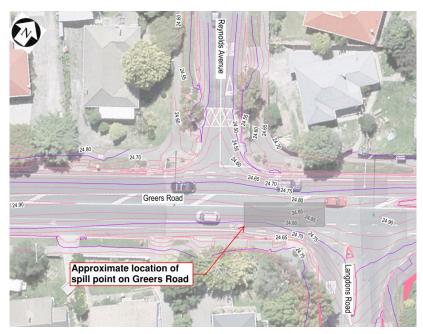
Existing contours at the Reynolds Avenue / Greers Road / Langdons Road intersection, generated from 3D strings in the CCC Survey (Dated 24.02.2023. Levels in Christchurch Drainage Datum 2019)
